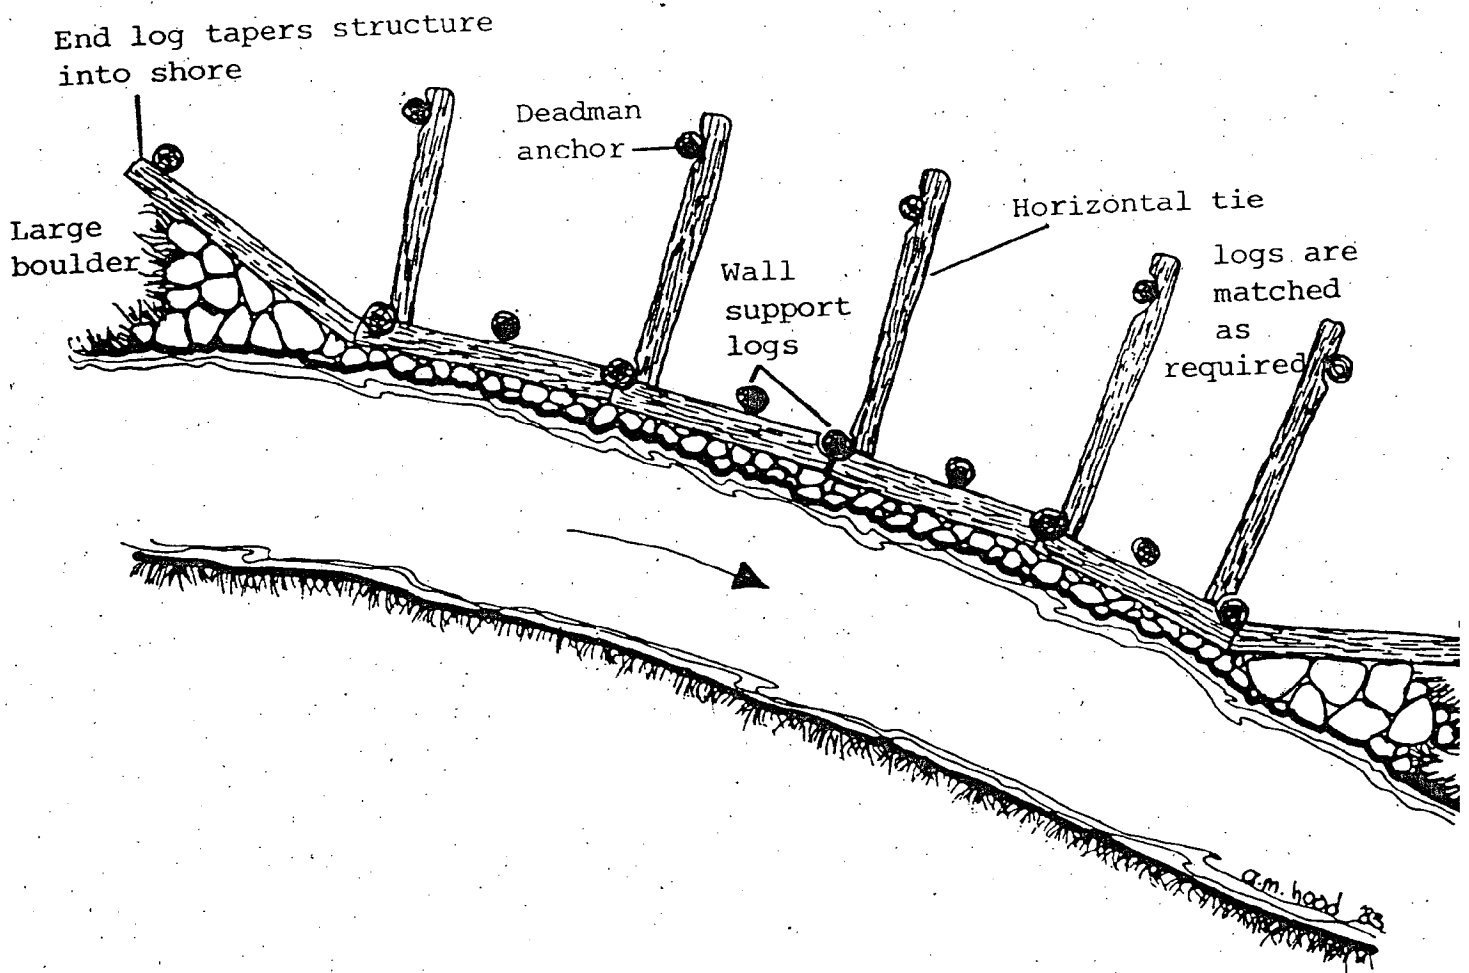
Plan view of exposed log wall structure. (Source: OMNR 1984)
